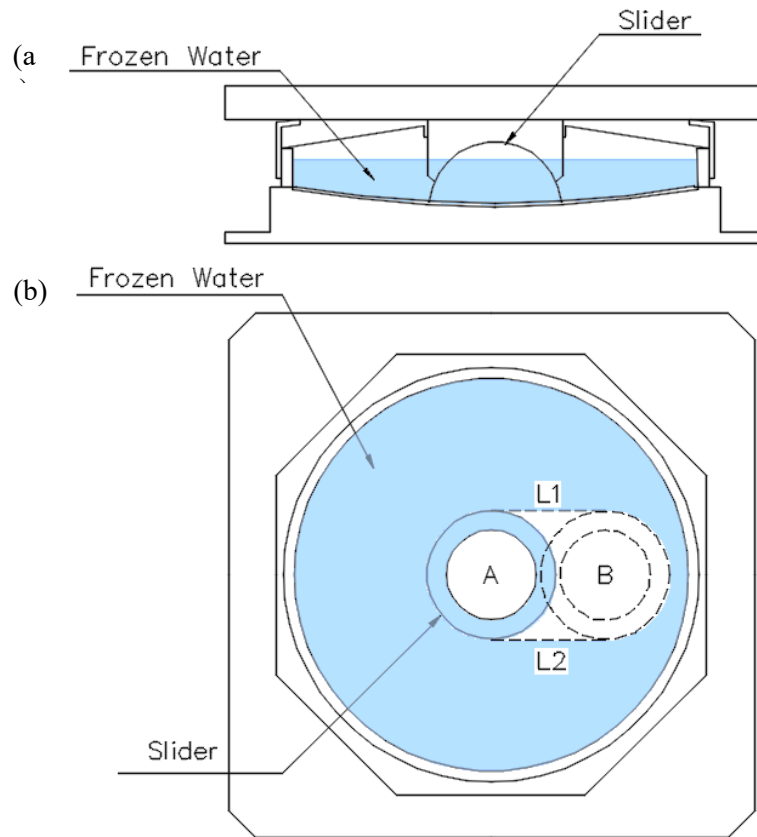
Ice contaminated FPS bearing drawing (a) Elevation (b) Plan view
